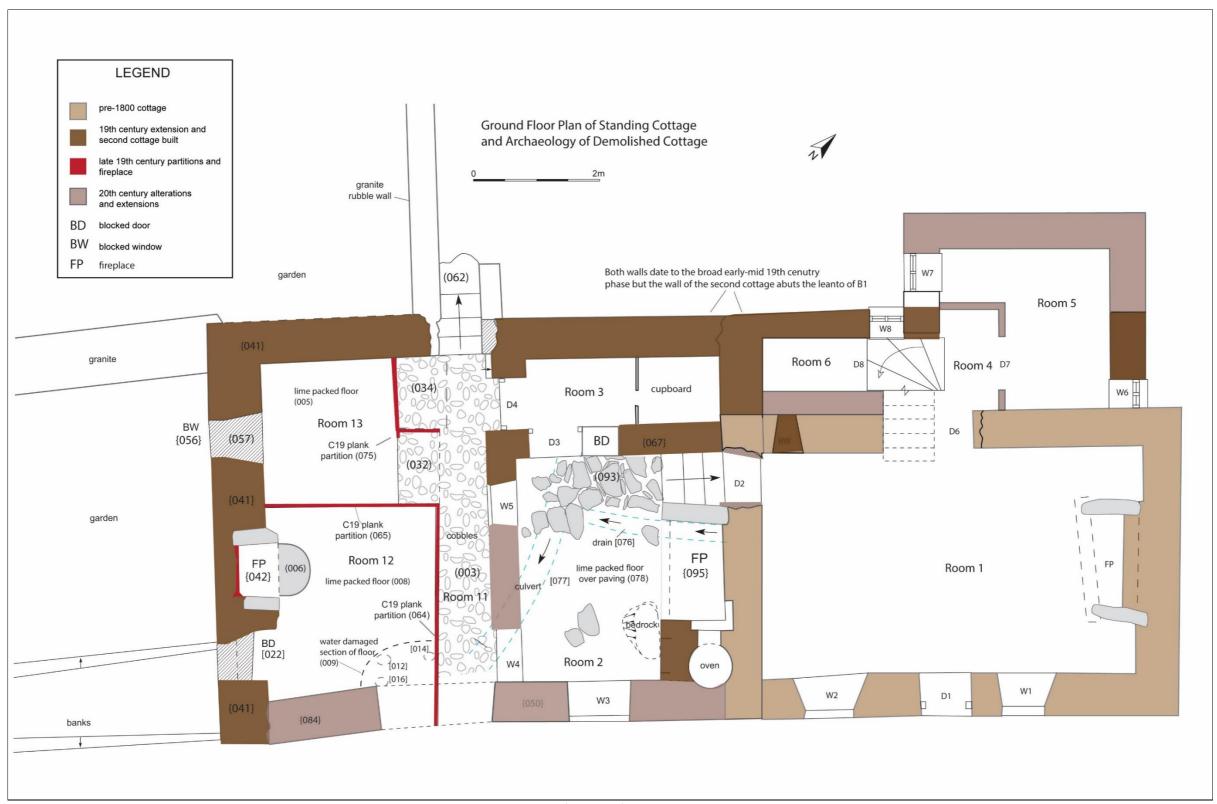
PHASED PLAN OF STANDING COTTAGE (BUILDING 1) AND DEMOLISHED COTTAGE & BUILDING 2, WITH ARCHAEOLOGY.
